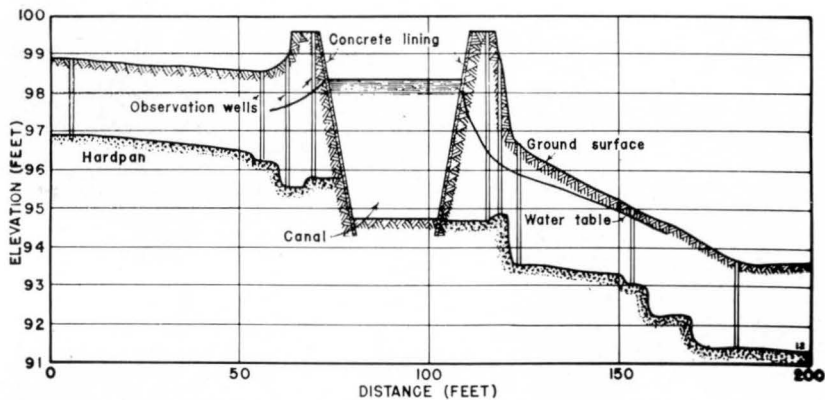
Ground-water profile perpendicular to concrete-lined section of Alta East Branch Canal at Brann's Crossing.
